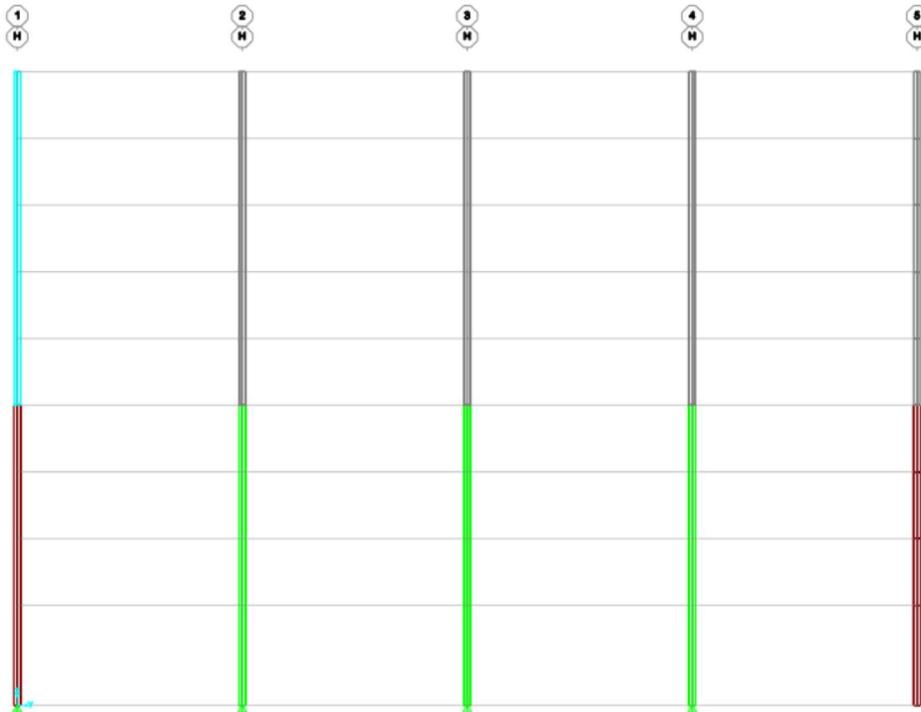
Column cross-section layout in the face H (SAP2000)
